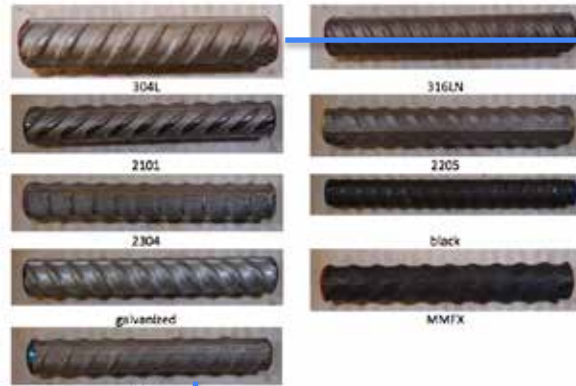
Steel rebar specimens prior to testing in the corrosion chamber
